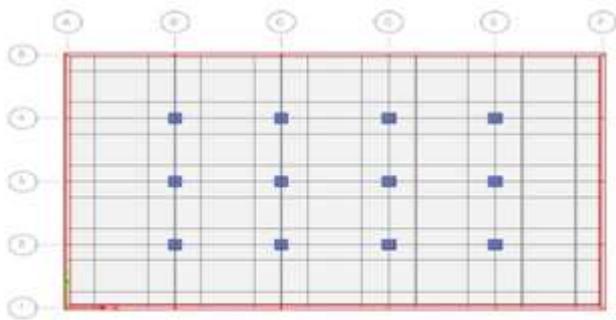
PLAN - FLAT SLAB WITH EXTERIOR - SHEAR WALL
